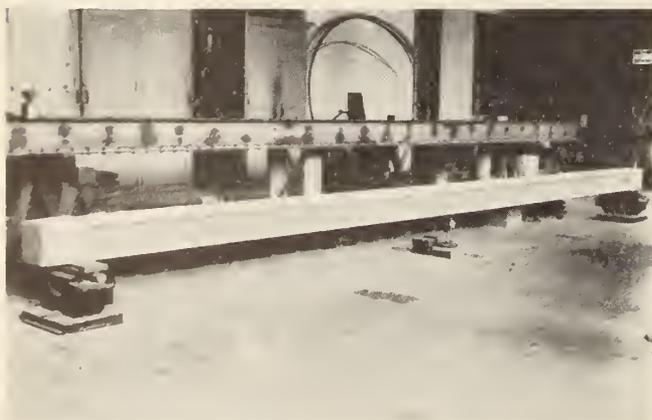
Factory-made 20-ft. span prestressed concrete beam.
